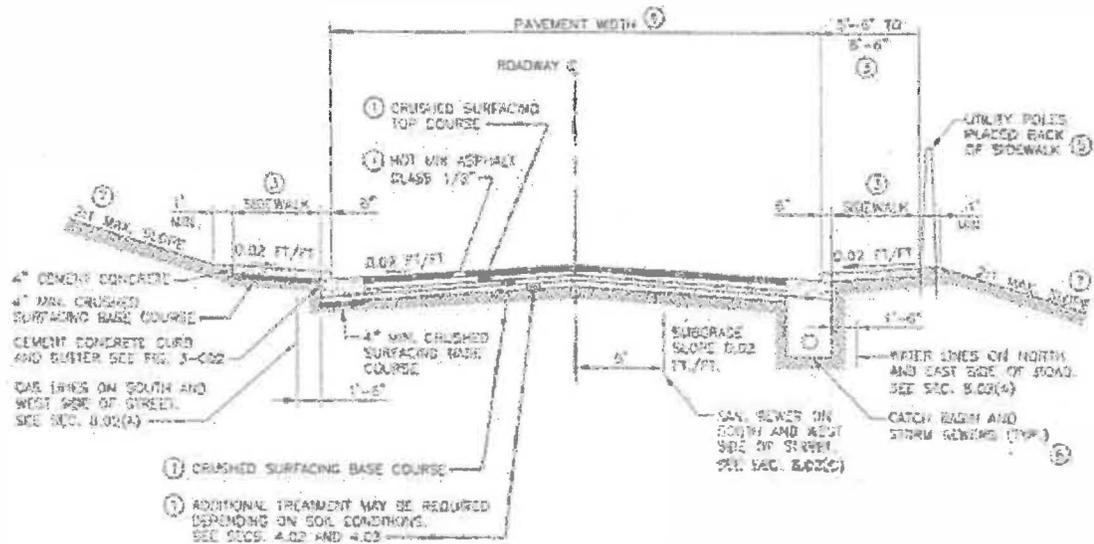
RDCS Figure 2.1 Showing Vertical Curb Typical Roadway
